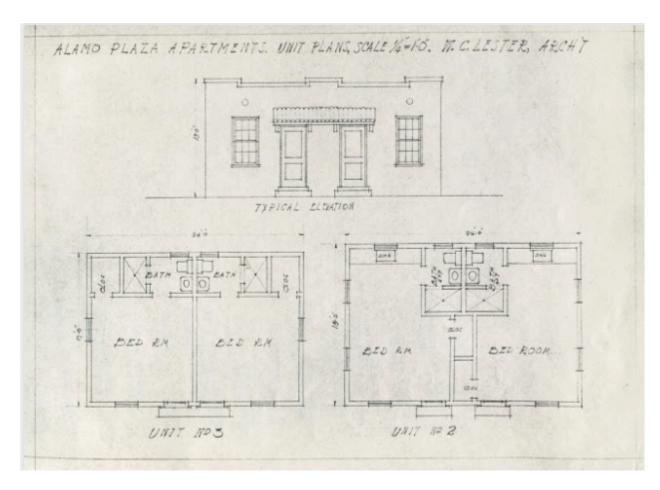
Alamo Plaza Apartments Unit Plans in Memphis. Memphis Board of Adjustment, Josh Whitehead.
